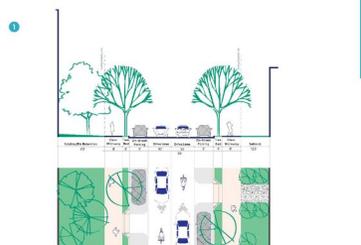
Typical Olive Avenue section between Park Boulevard and Ash Street
